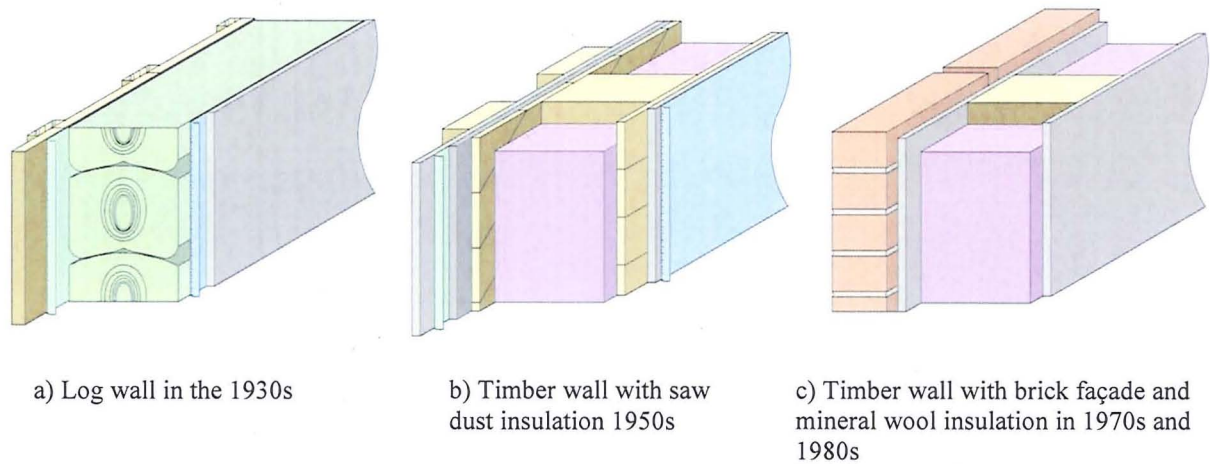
Evolution of the timber wall in Finland (Heikkilä & Suikkari, 2001)
